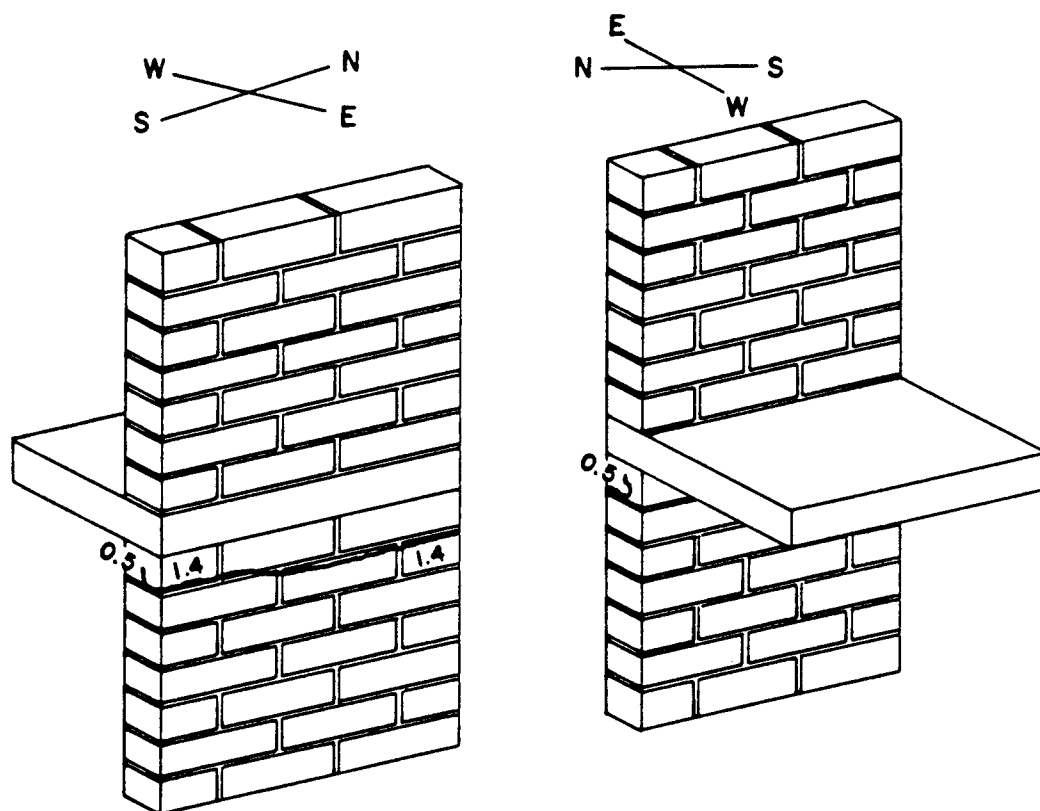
Crack Distribution at Failure on Specimen WSA400
